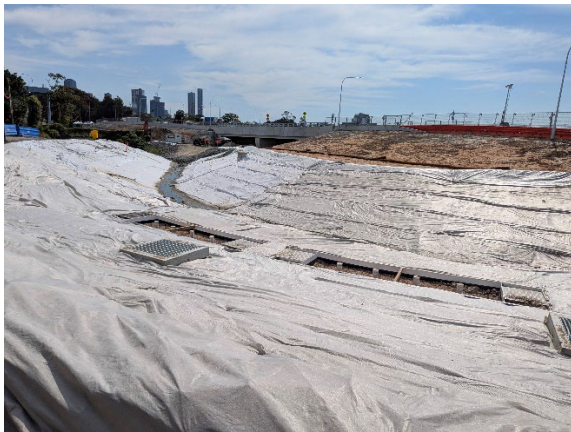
Clyde MSF West – Area 1 Swale Drain improvement works ongoing.
